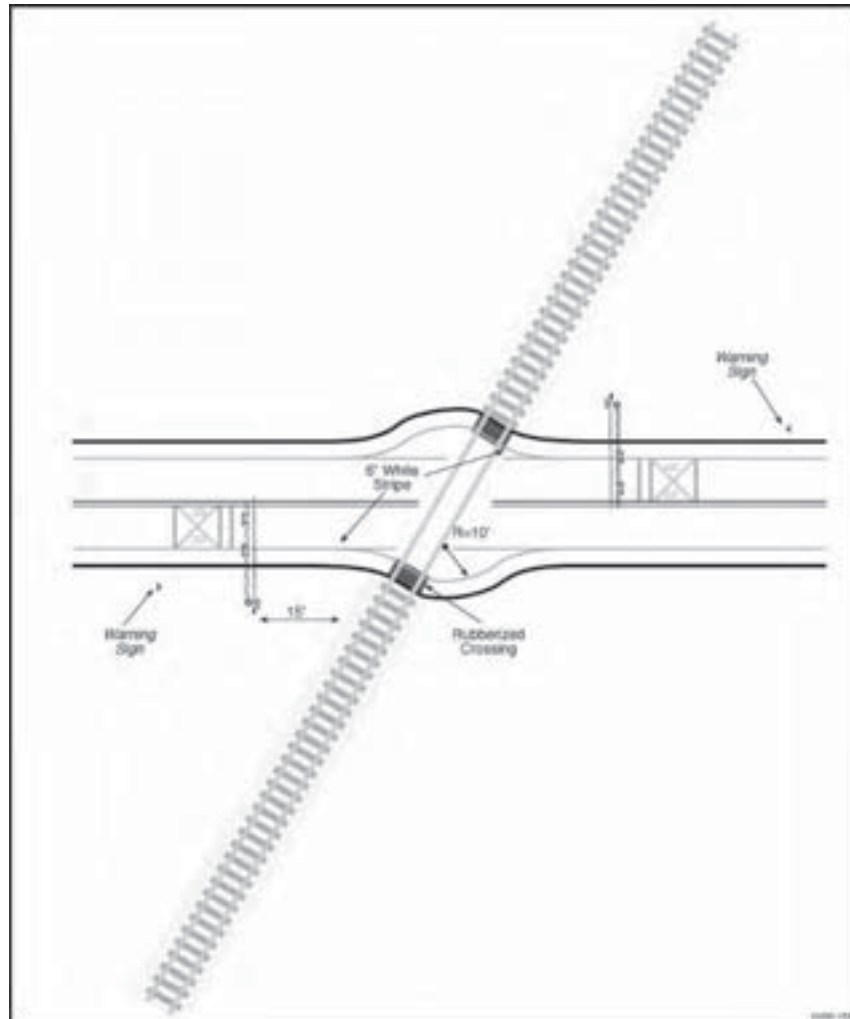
Bike Lanes Crossing at Railroad Tracks
